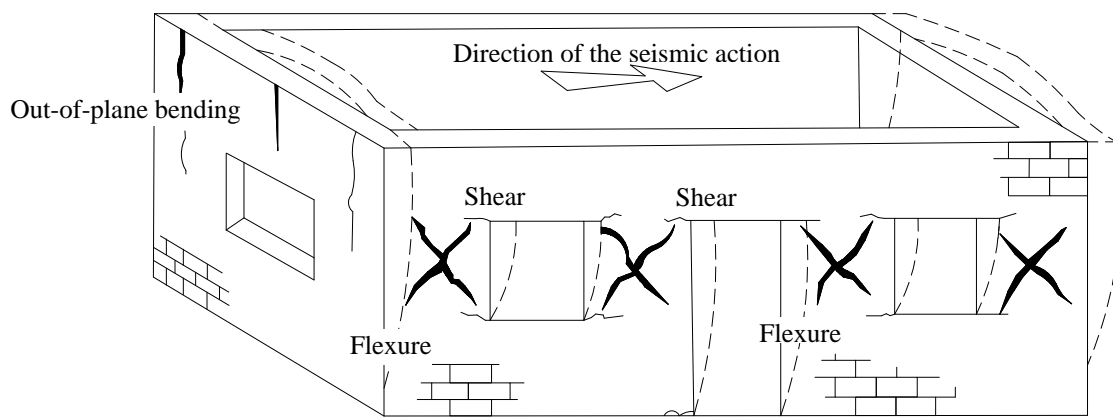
Typical deformation and damage of unreinforced masonry buildings under seismic loads (adapted from Tomažević 1999).
